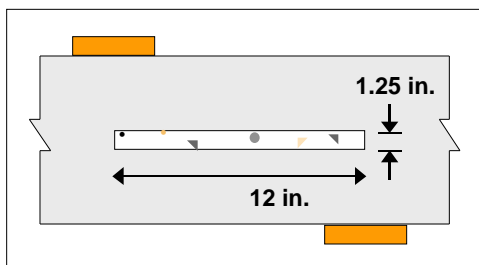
Specimen 8.RC, Rectangle of Steel Removed
